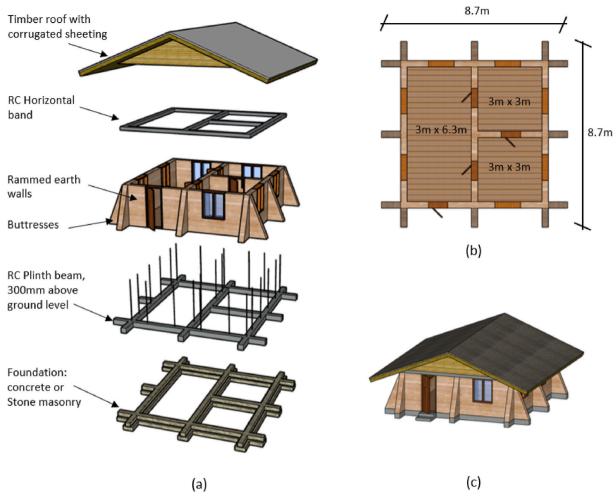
Exploded view (a), plan view (b) and finished view (c), of proposed rammed earth house.
